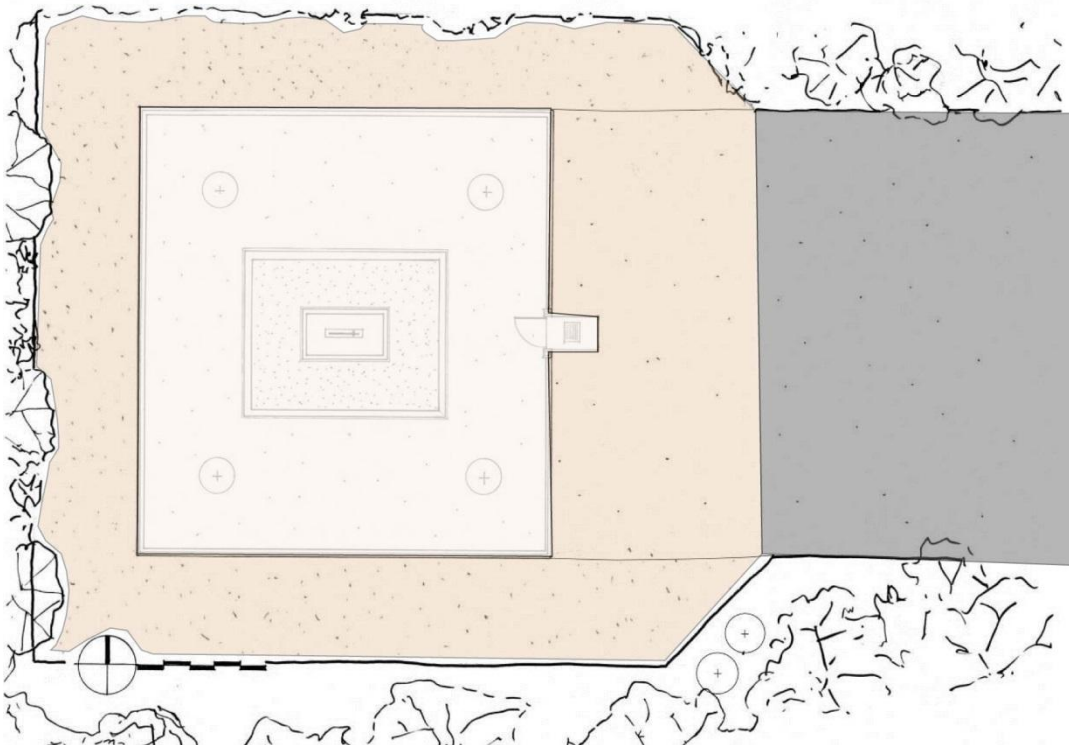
Proposed Landscape Treatment —showing asphalt and dirt/gravel areas (Source: GML on Pip Giovanelli Plan , 2011)
